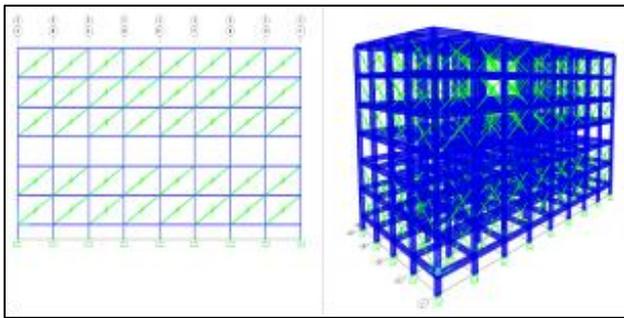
Elevation & 3D View of G+5 soft storey at second floor.
